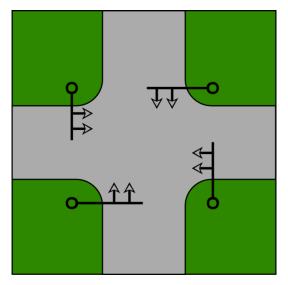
Mast Arm Arrangements: Single Mast Arm
